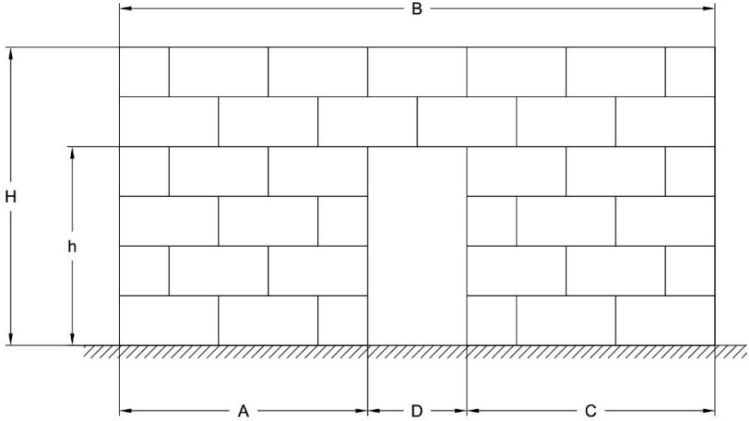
8 – Gabion wall with opening, with A equal to C.
